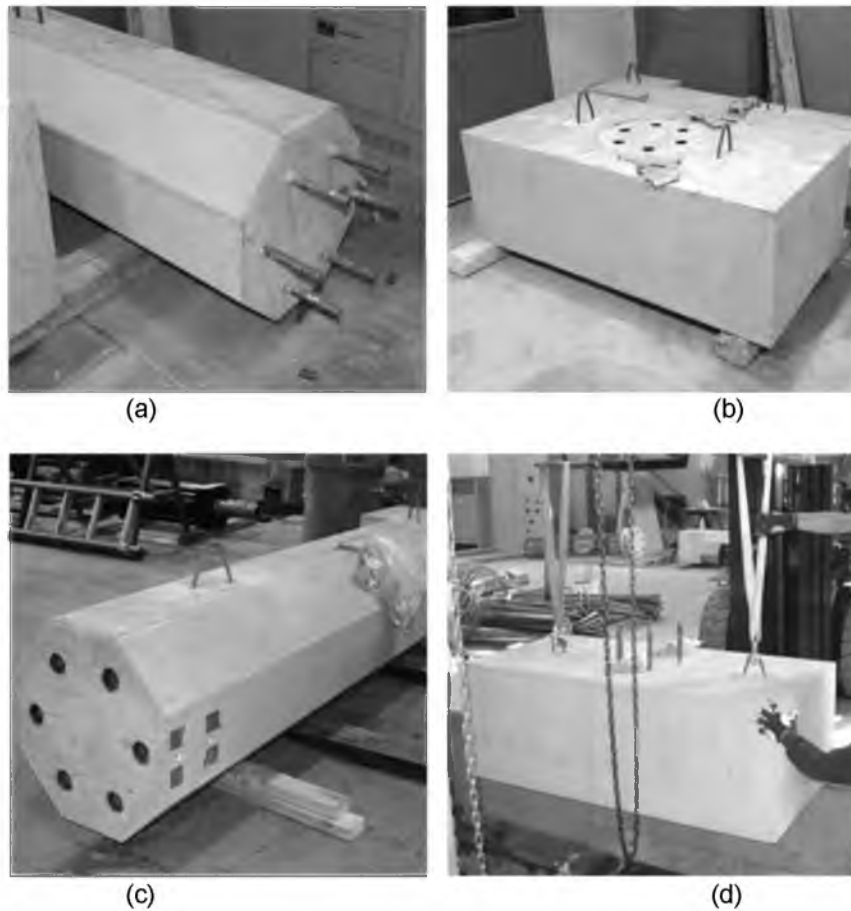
Precast columns and footings prior to grouting: (a) NMB-2 column, (b) NMB-2 footing, (c) NMB-3 column, (d) NMB-3 footing
